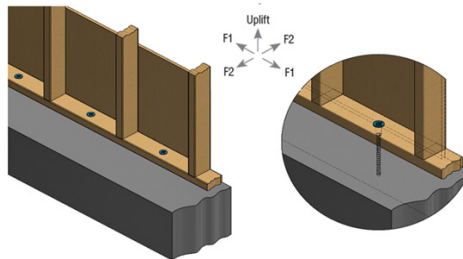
Sill Plate Anchor Load Directions (F₁ and F₂) - Installation in Slab
